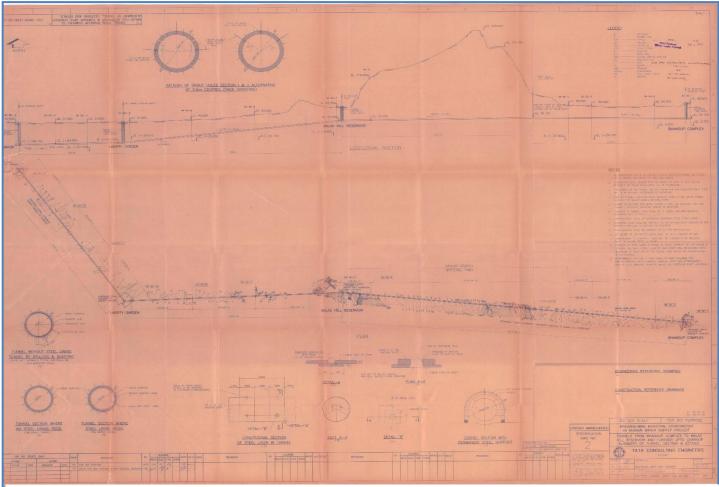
Details Section of Bhandup - Charkop Tunnel crossing below GMLR Alignment
